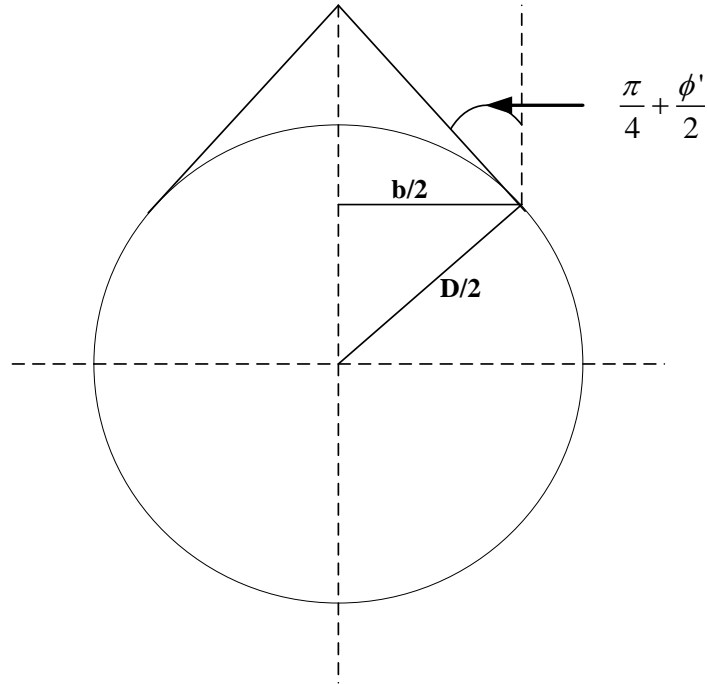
Geometric derivation of the trapdoor width (*adapted from Staheli 2006*).
